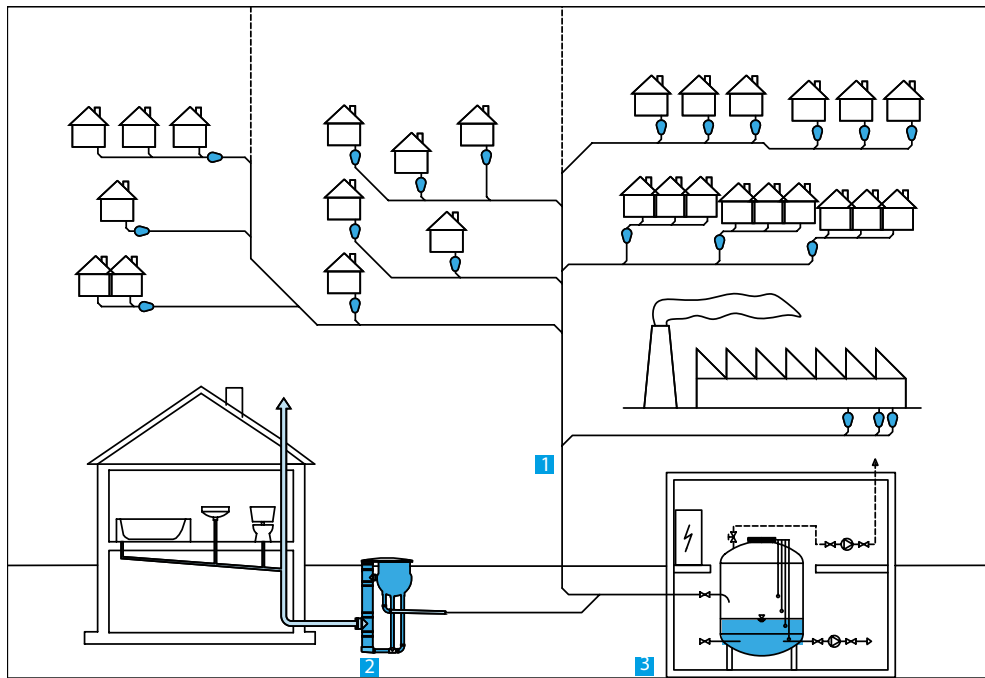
SCHEMATIC DRAWING OF A VACUUM SEWER (SOURCE: ROEDIGER VAKUUM GMBH)
